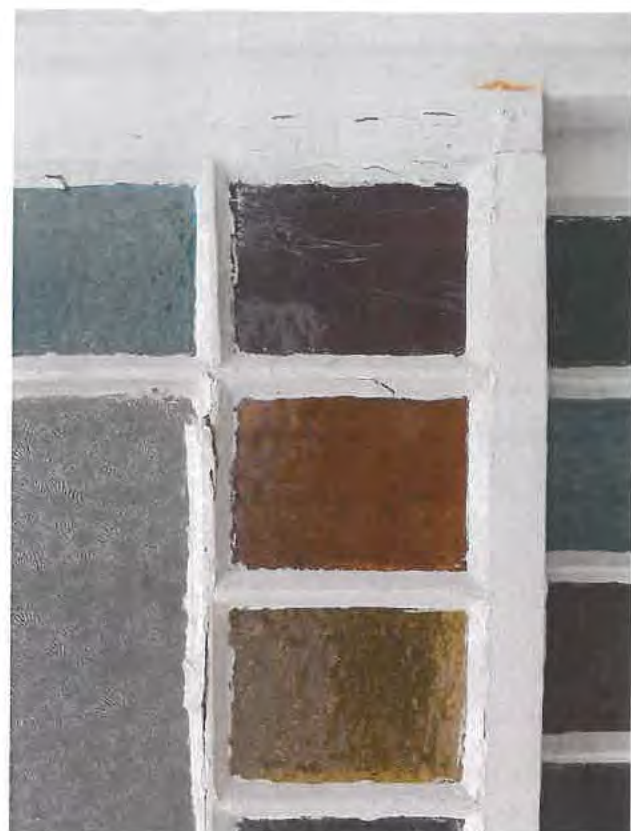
Deteriorated glazing putty and paint is typical. Note dropping bottom rail and stain from rusting fastener.
